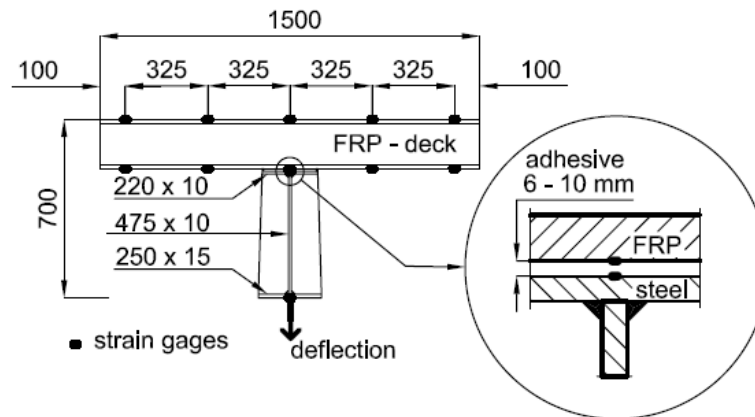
Cross section of the test set-up of a hybrid (FRP-steel) girder (Keller & Gürtler, 2005)
